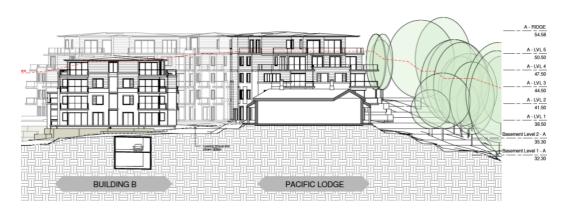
Proposed section (north facing, similar perspective to Figure 4)
